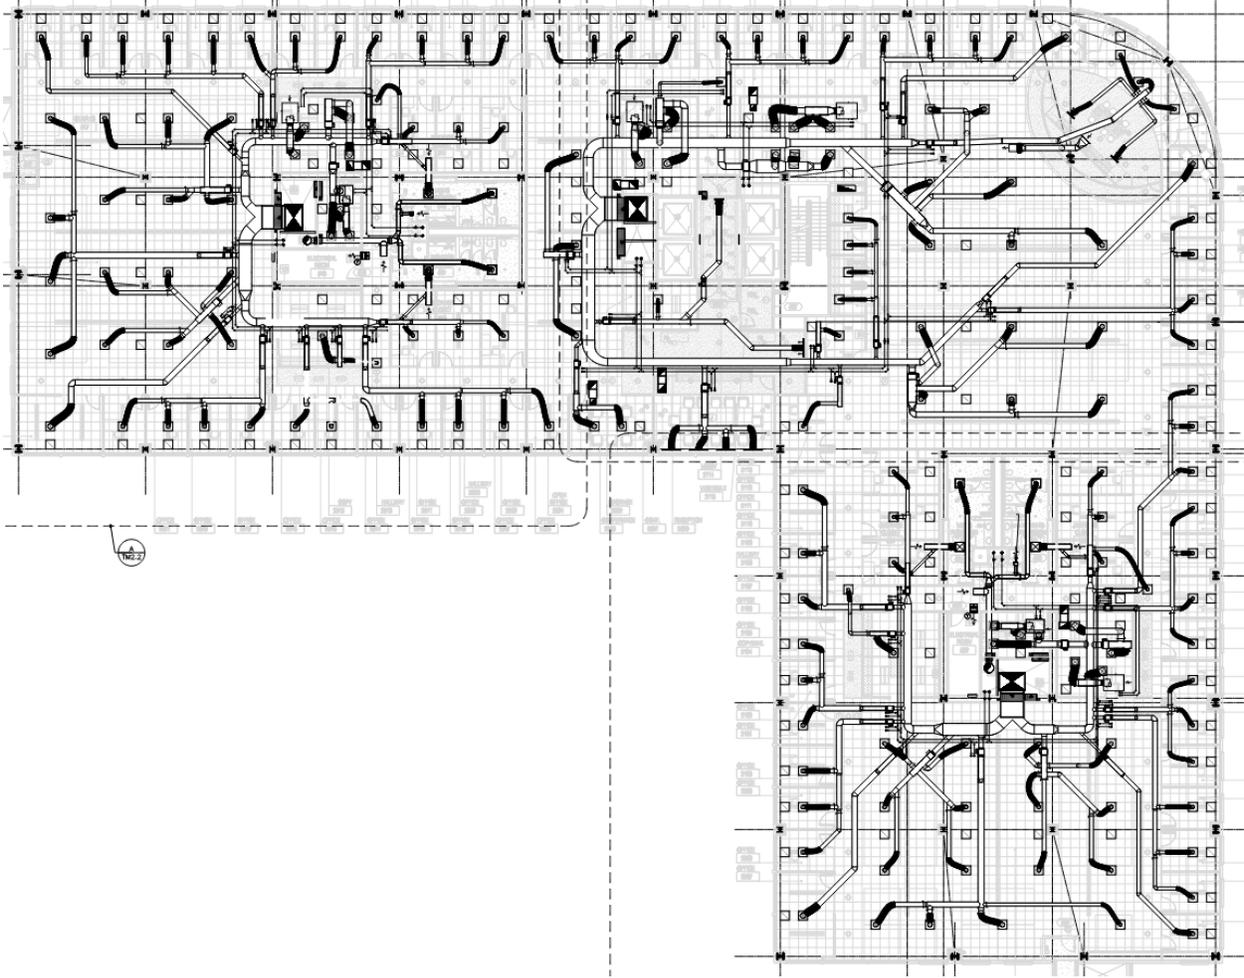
Typical Floor of 5-Story, 200,000 ft² Large Office Building
